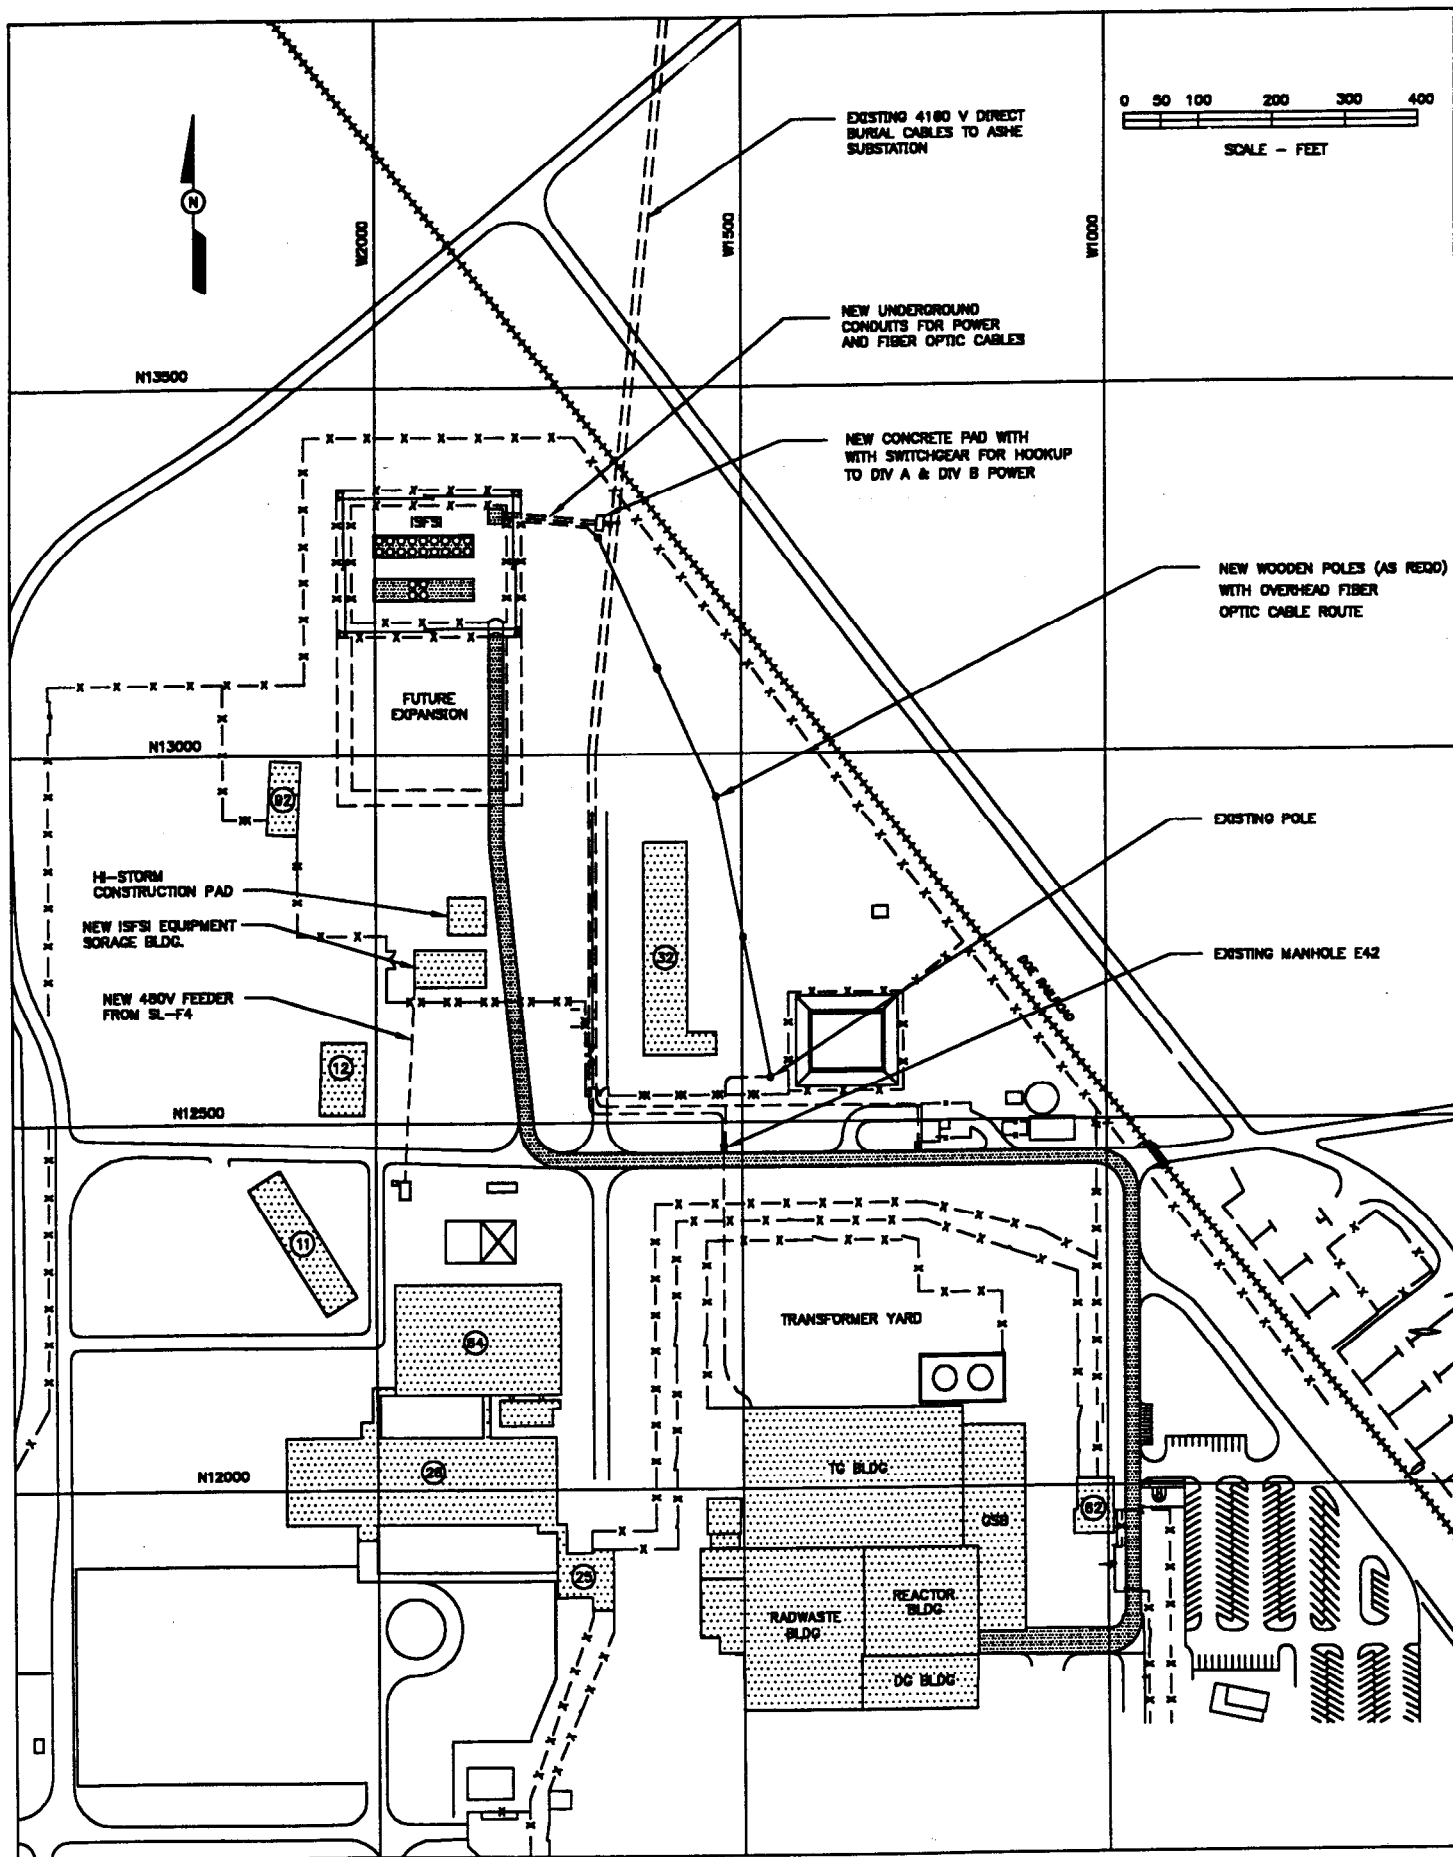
Site Plan for WNP-2 Cask Storage Facility and Transport Roadway
